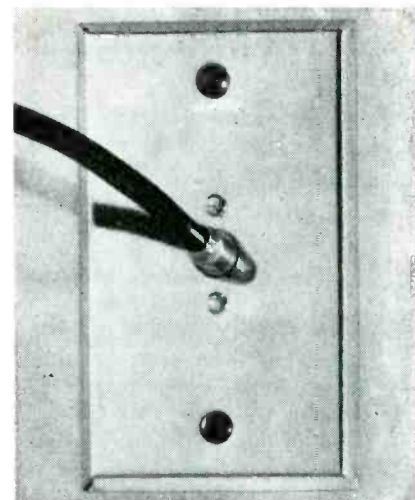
Outlet plate for permanent installations suitable for use with Wiremold box or standard wall-outlet flush box.
